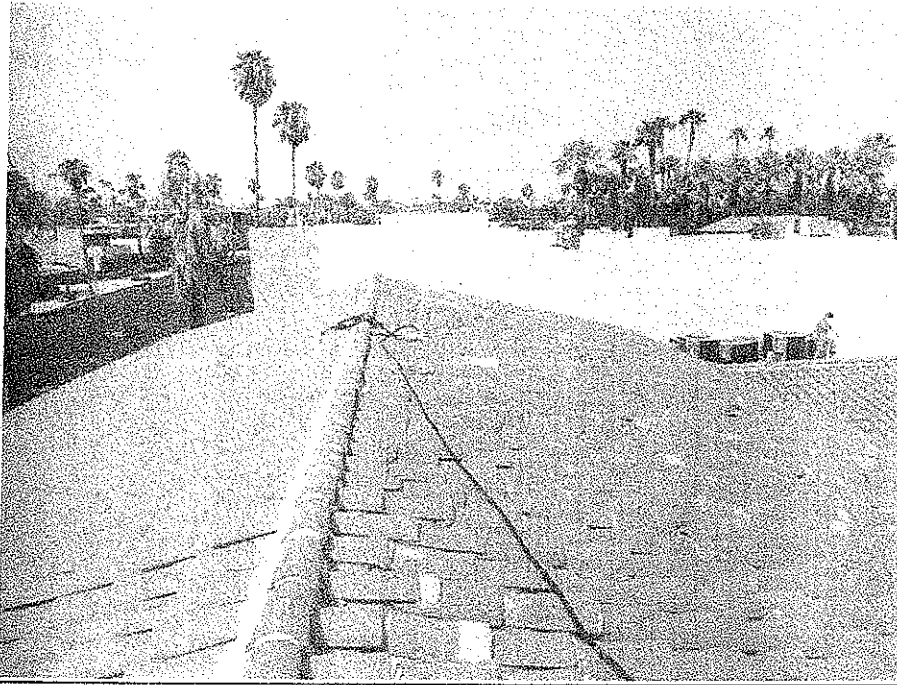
Main roof over Suite F has no fasteners used in the roof tile.
